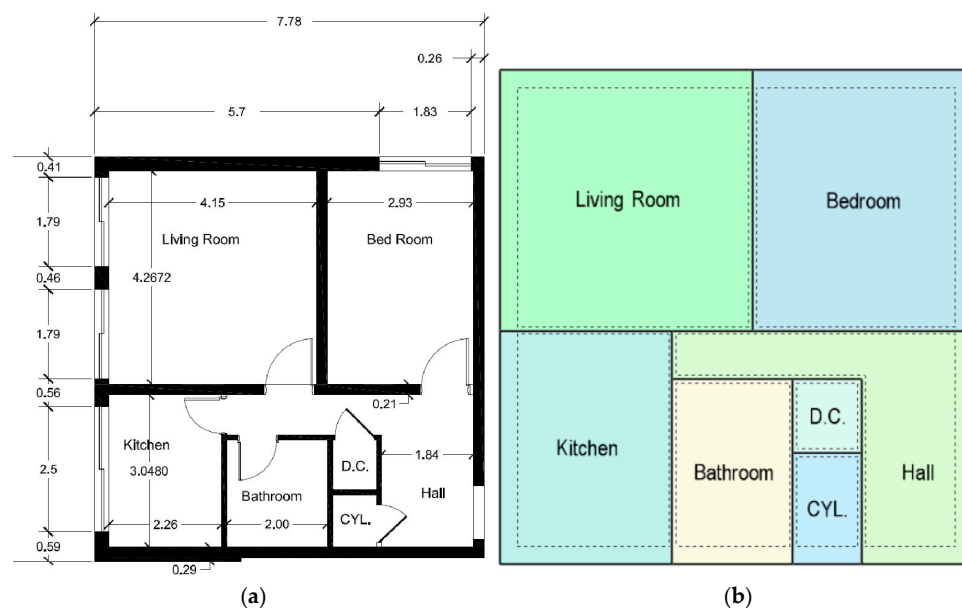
Flat's floor plans: (a) floor plans (produced by the author; derived from [70]), (b) Design-Builder model, showing zones activities.
